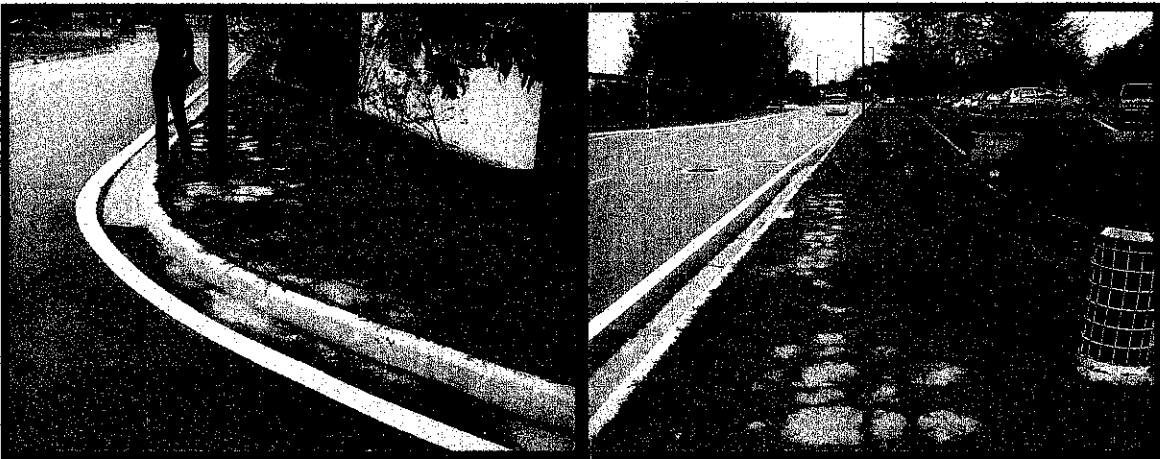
Sidewalk along the road from Village 2 to Village 4 which is not properly provided.
